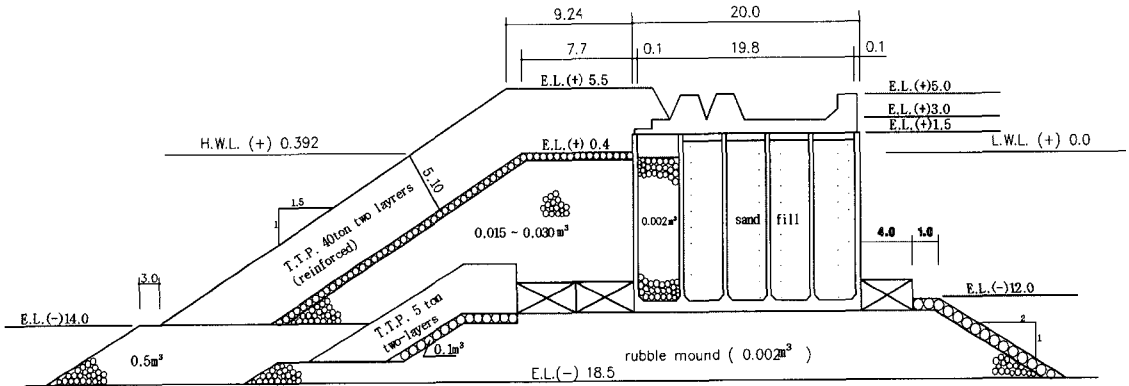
Cross-section of Section 11 after reinforcement. (unit: m)
